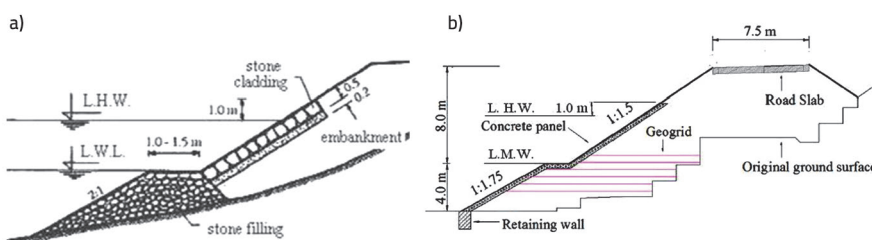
Protection of the embankment toe: a) on railways [1]; b) on roads [2]
